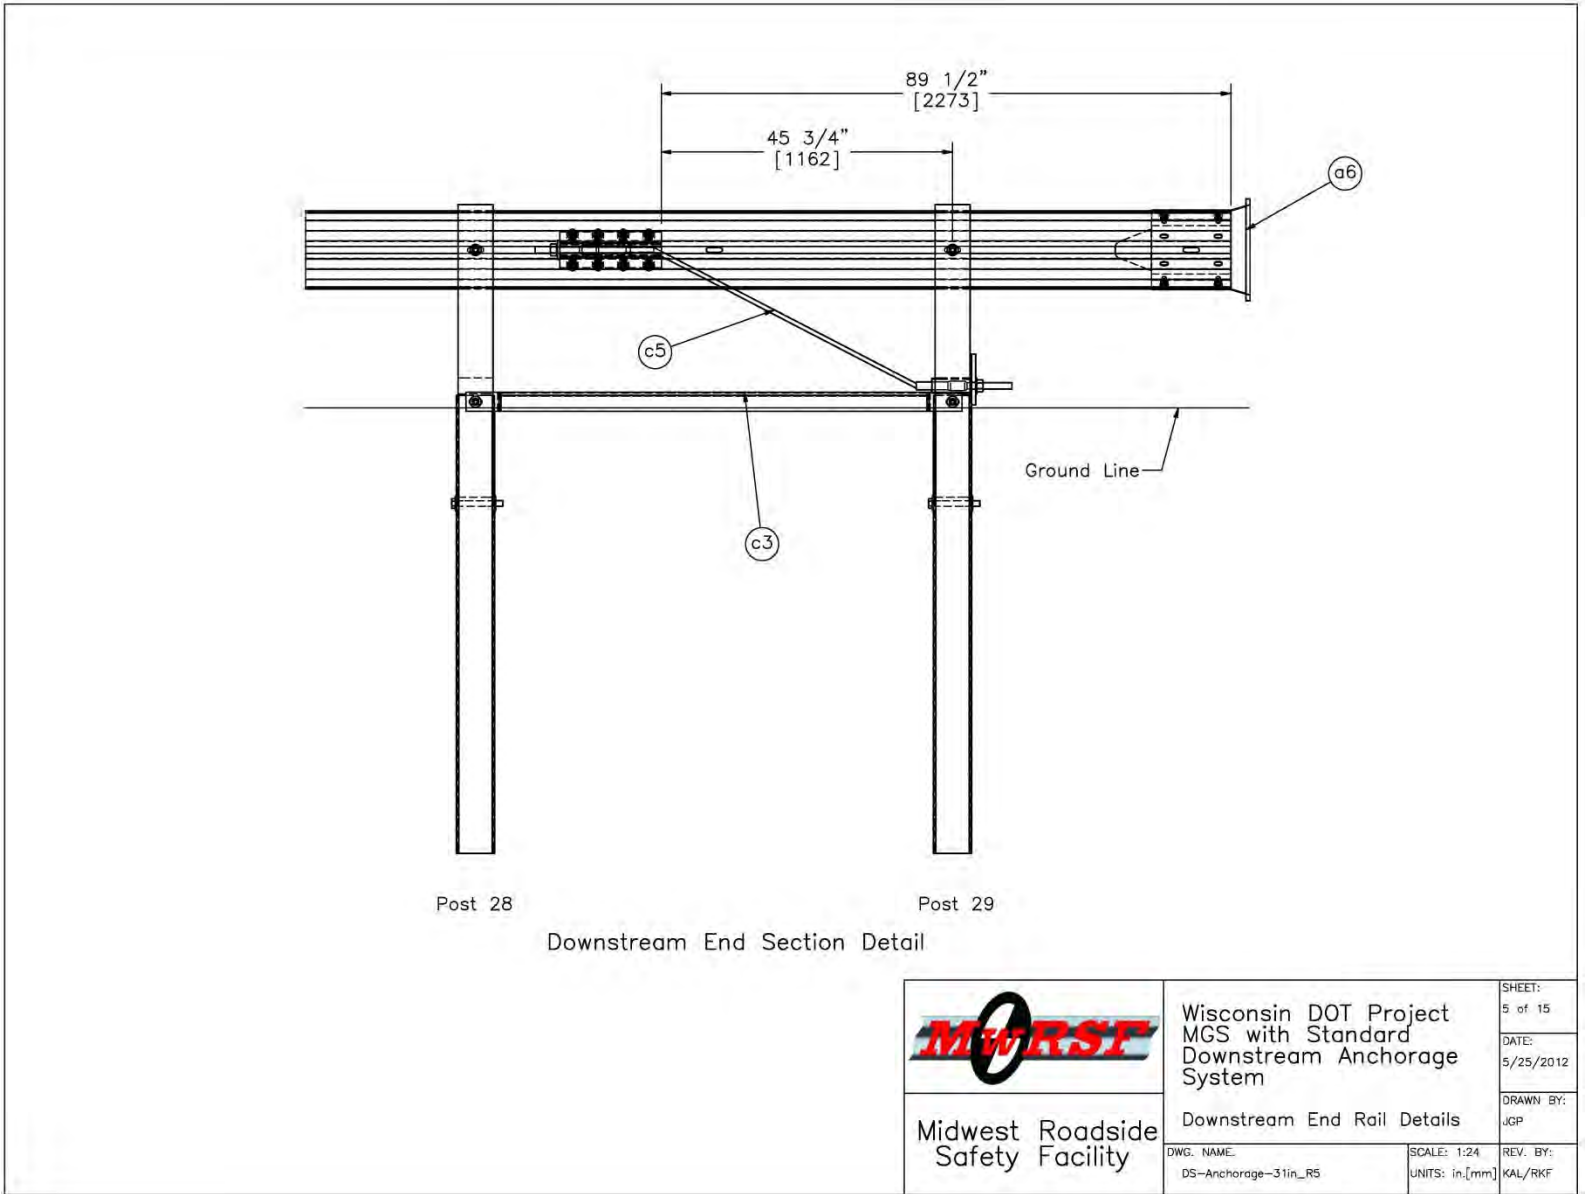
Downstream End Anchor Details, Test No. WIDA-1
